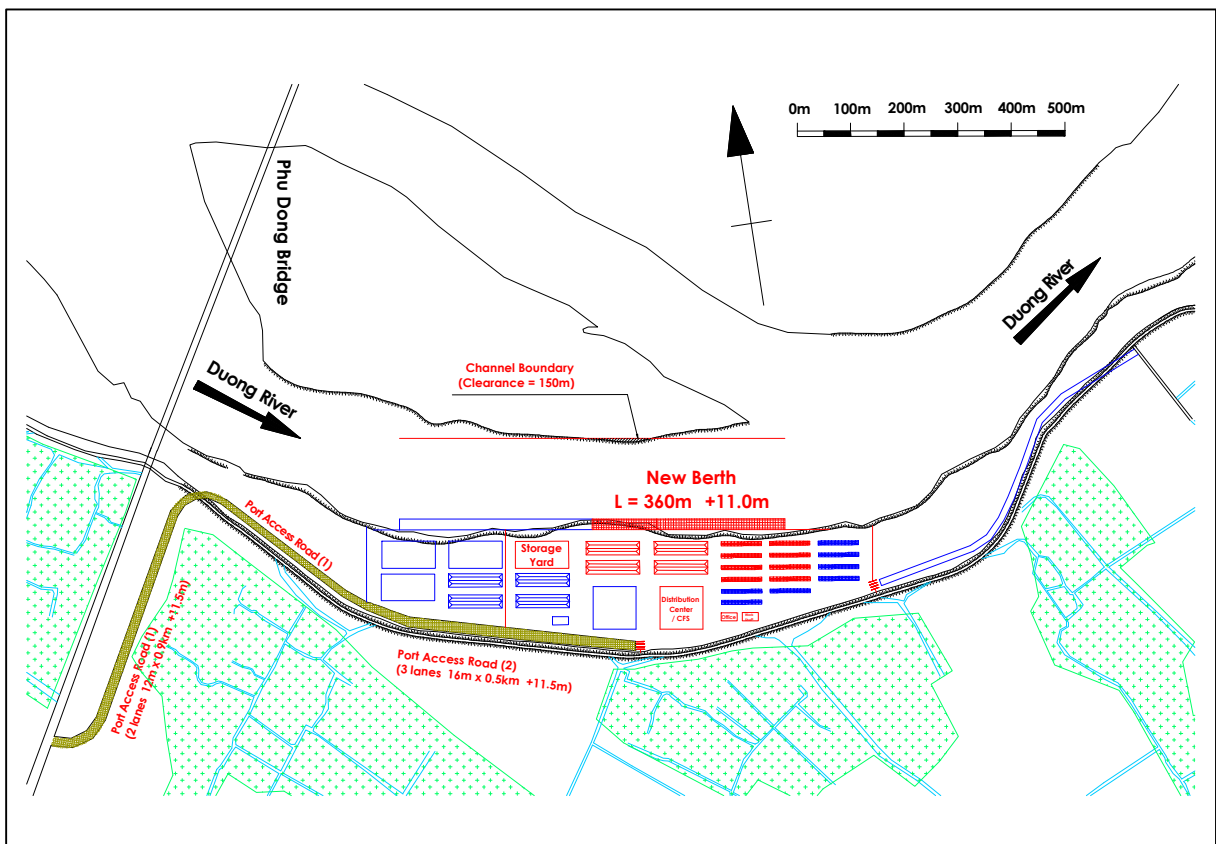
Short-term Road Development Plan of New East Port (2010)
